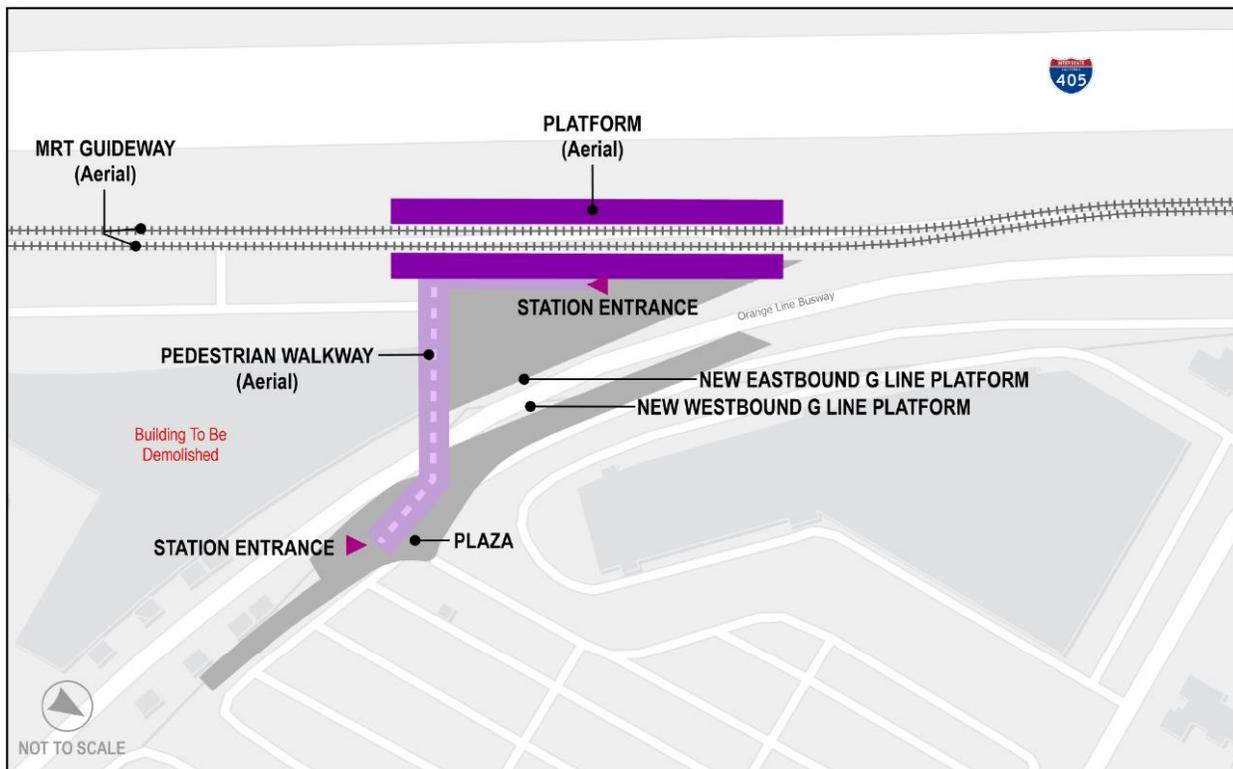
Alternatives 1 and 3: Ventura Boulevard/Sepulveda Boulevard Station
